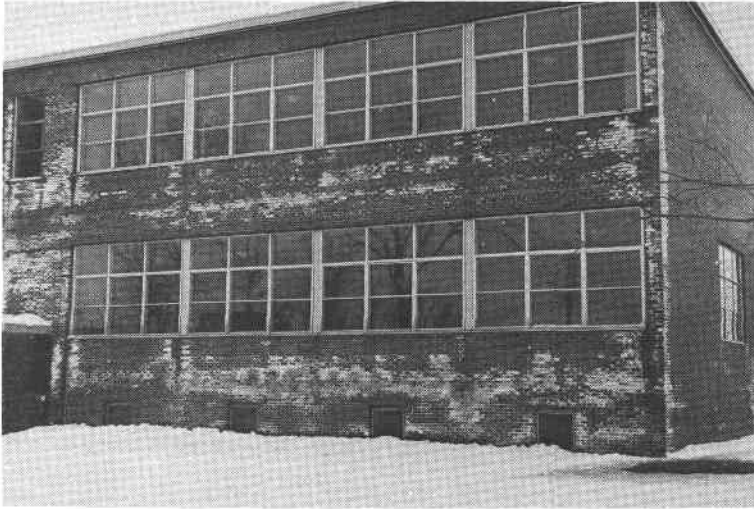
Directional influence on efflorescence; east wall affected, north wall much less affected.
